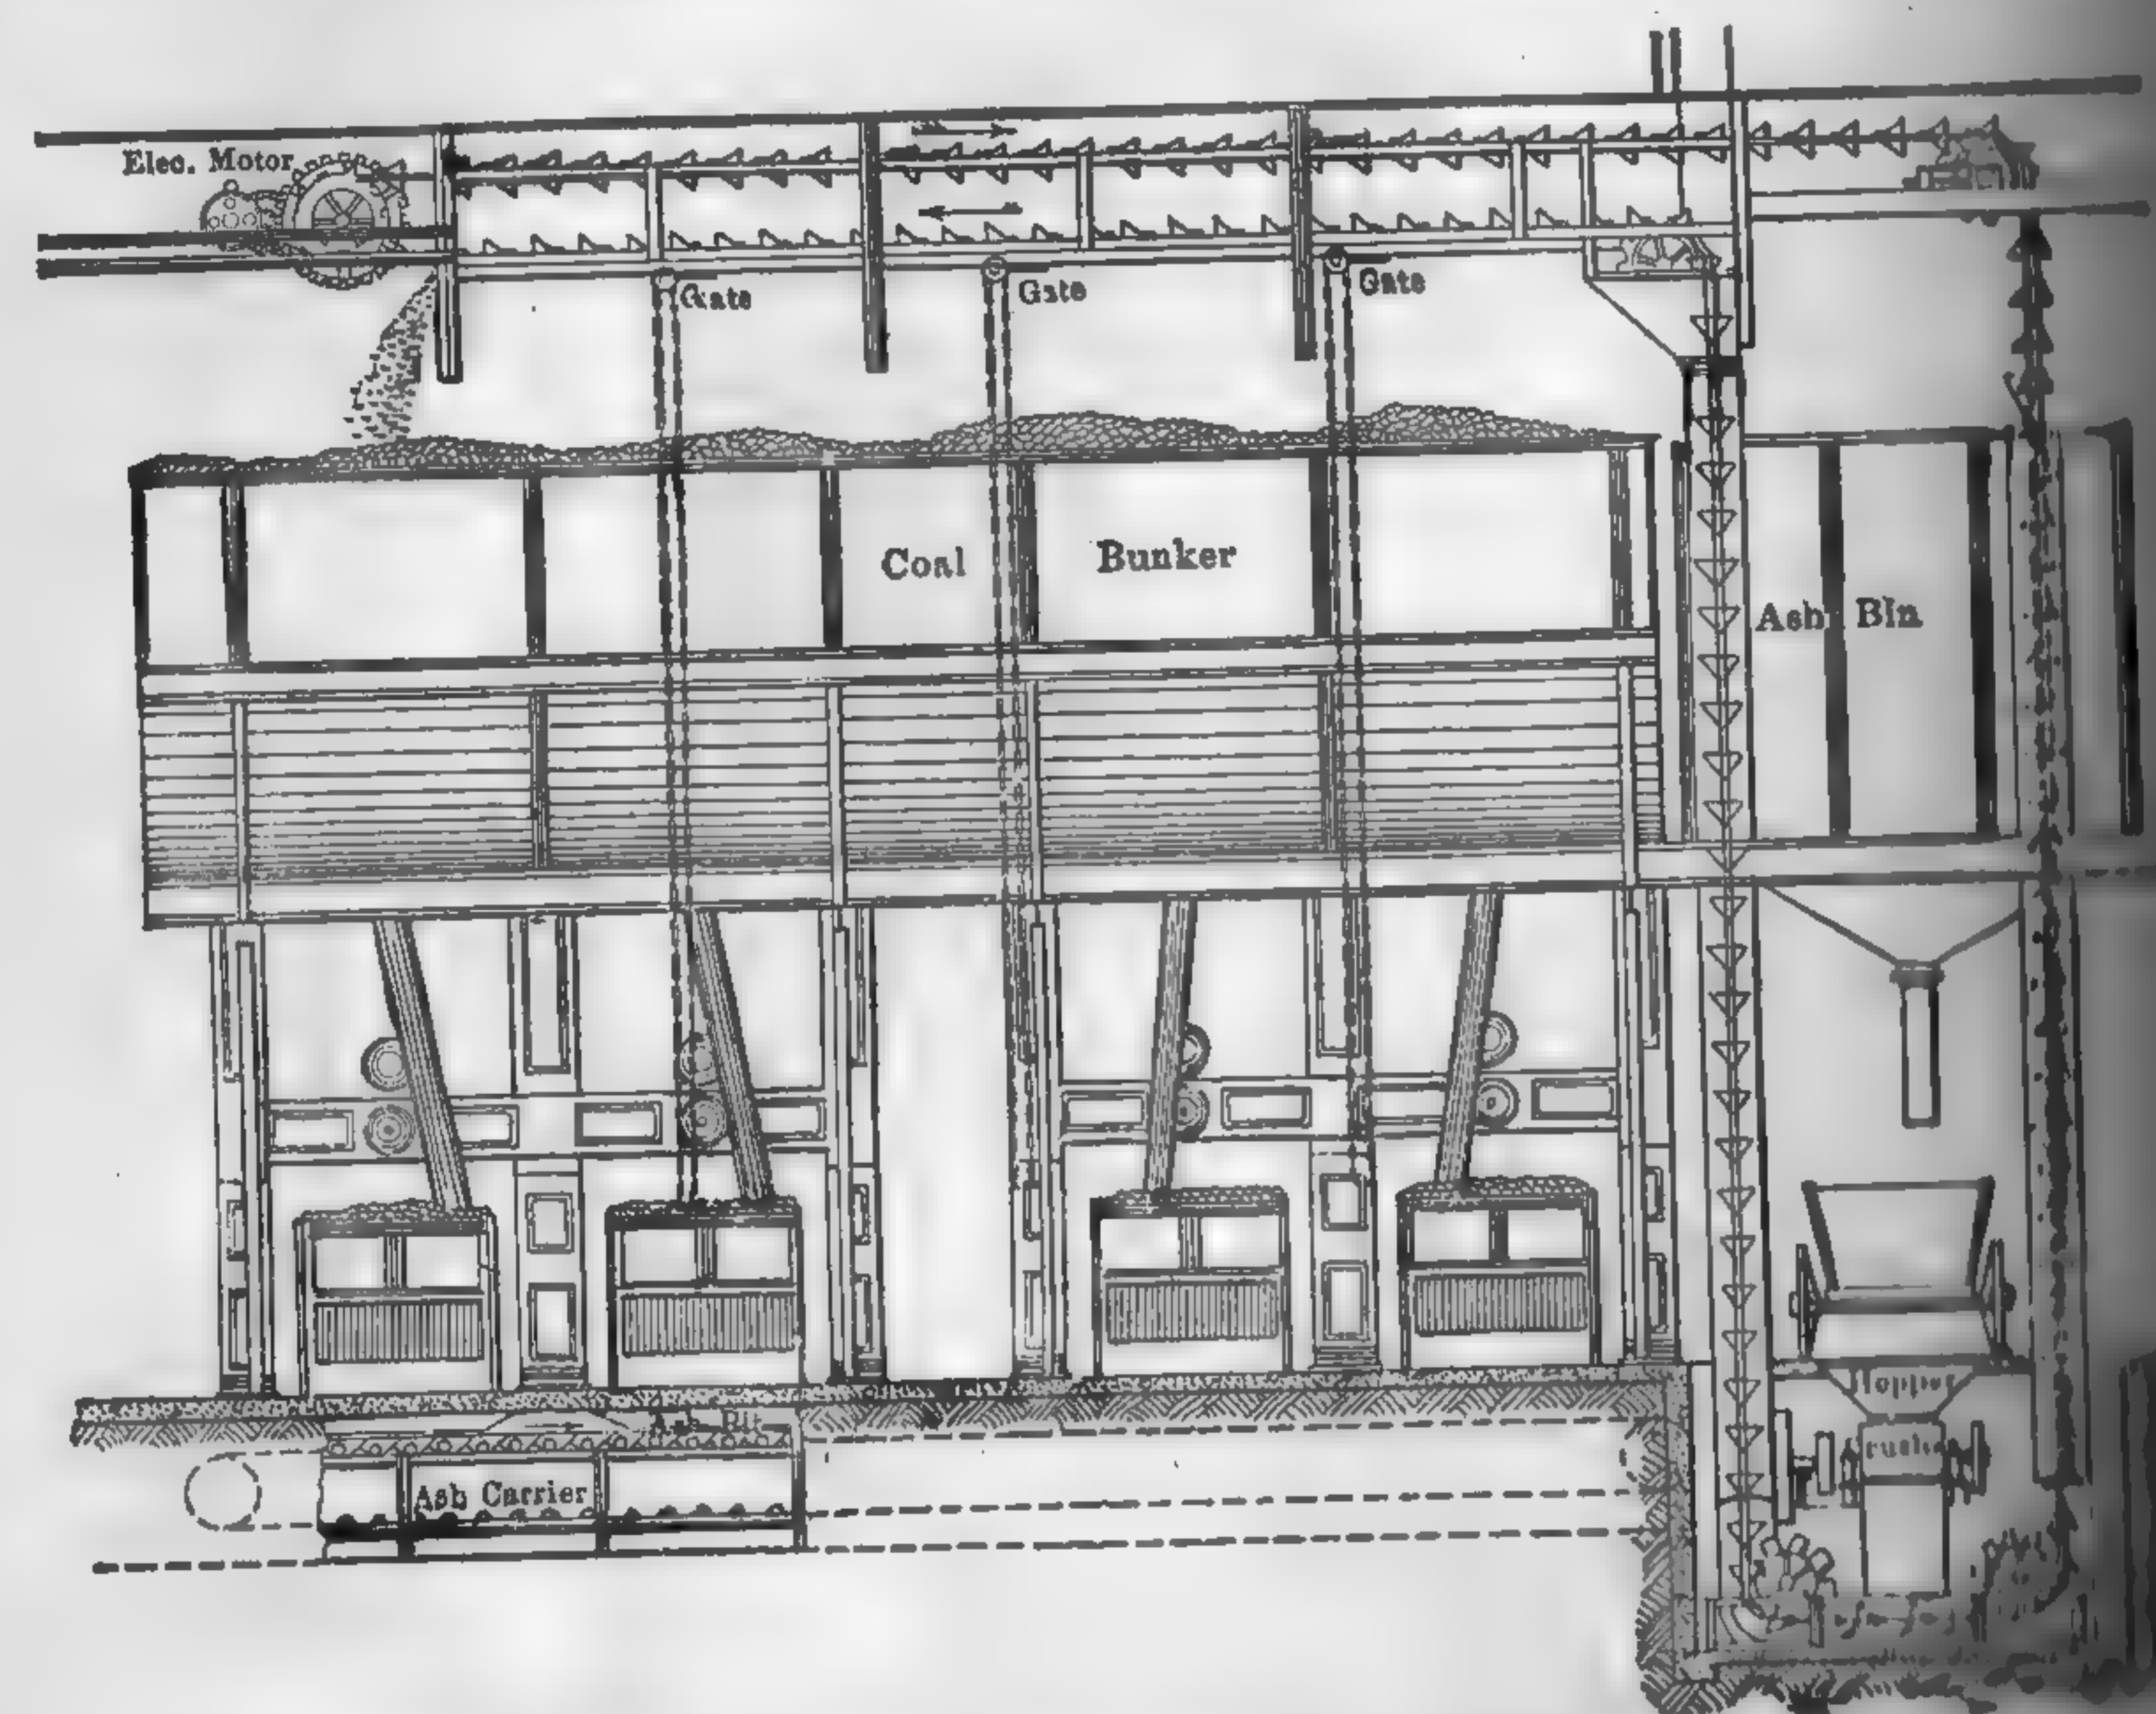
Typical V-Bucket Installation for Handling Coal and Ashes
